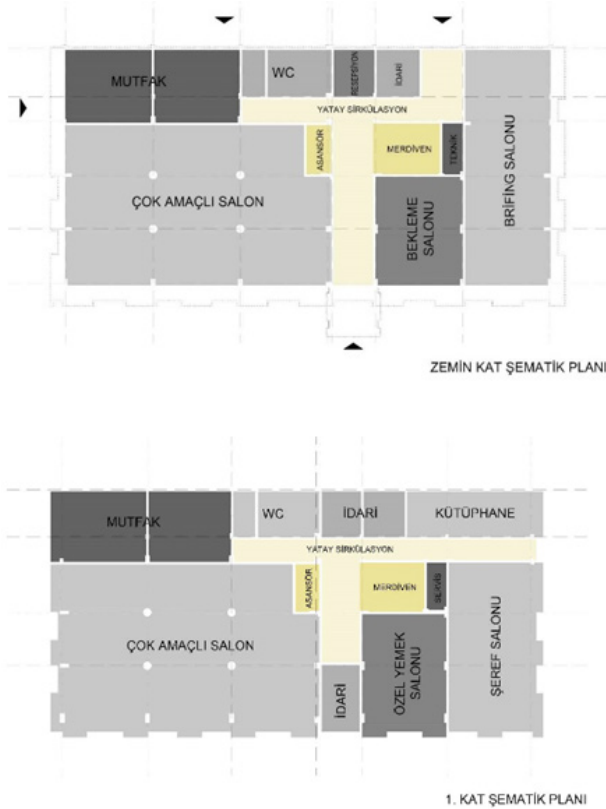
Schematic ground floor and first floor plan of the Guesthouse building.
